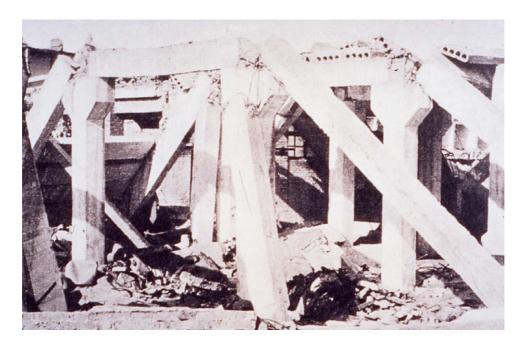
Unseating of precast concrete beams off corbels of columns
